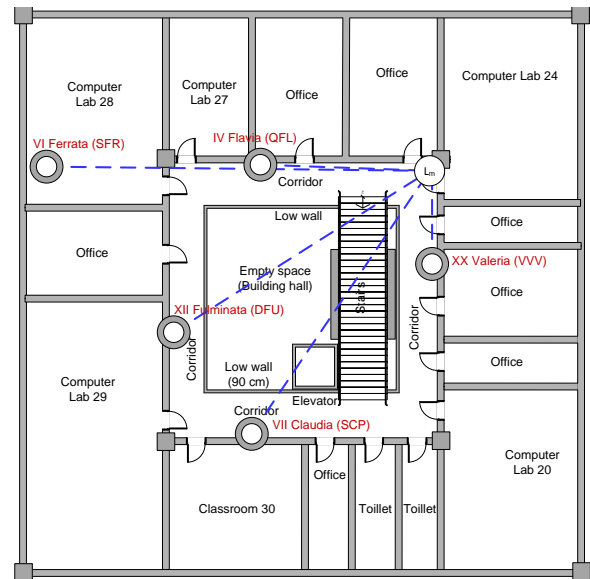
The layout of the institutional building 2nd floor where the experiment took place
